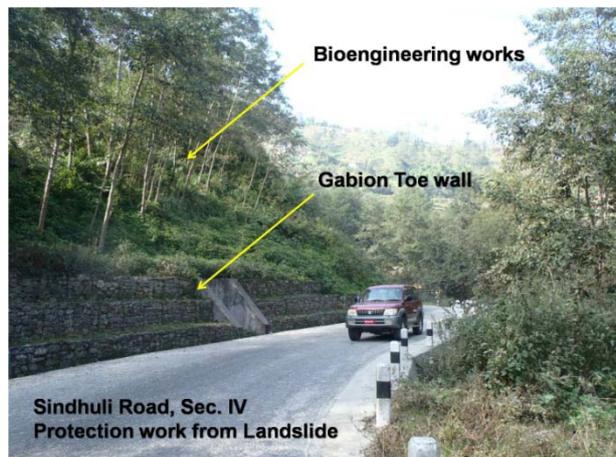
Road protection from landslide by construction of gabion toe wall and bioengineering works, Sindhuli Road, Sec. IV.
